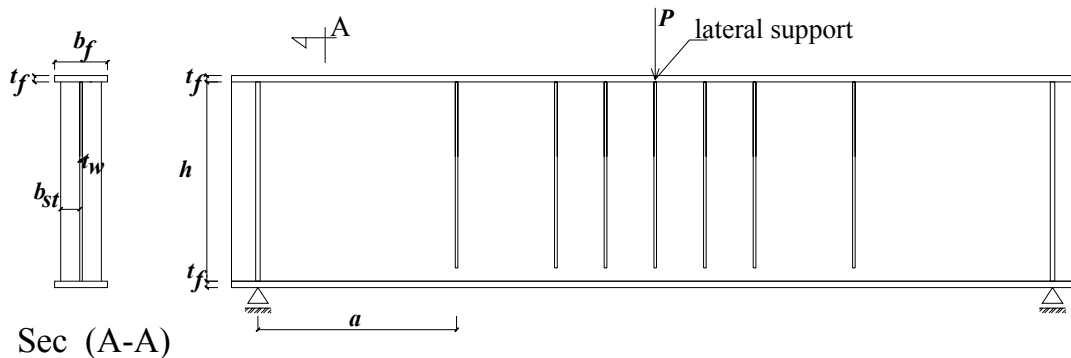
Geometric Configuration of Transversally Stiffened Plate Girder
